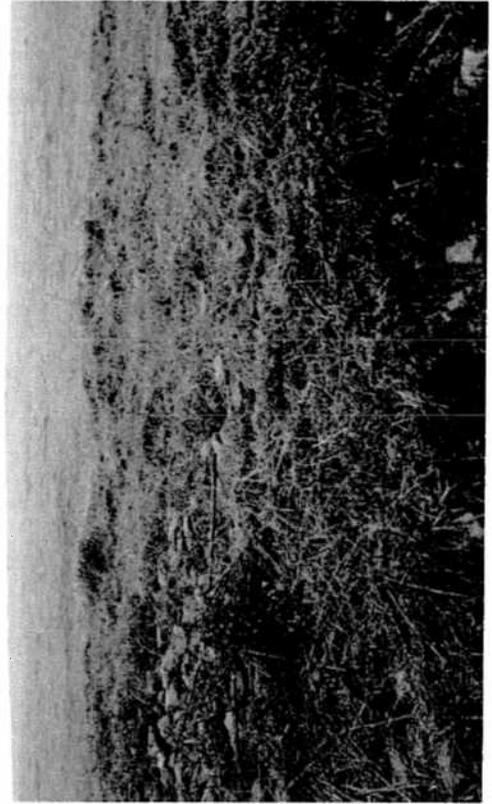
Condition of Main Ash Pond Dam Near Maximum Section
